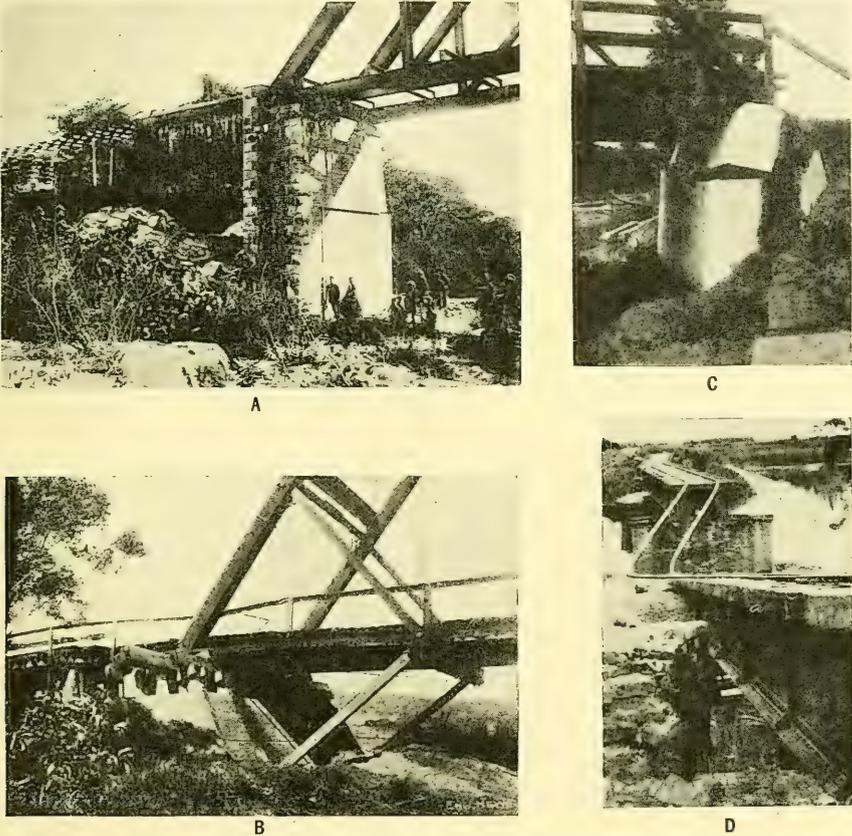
(A) Bridge of Tokaido Railway near the Kisogawa with abutment broken by the approach of river banks during Japan earthquake of 1891 (after Milne and Burton). (B) Bridge over Salinas River with distorted abutment damaged during California earthquake of 1906 (after Derleth). (C) County bridge over Pajaro River at Chittenden, California, after the California earthquake of 1906 (after Dudley). (D) Manshai bridge after the Assam earthquake of 1897 (after Oldham).
